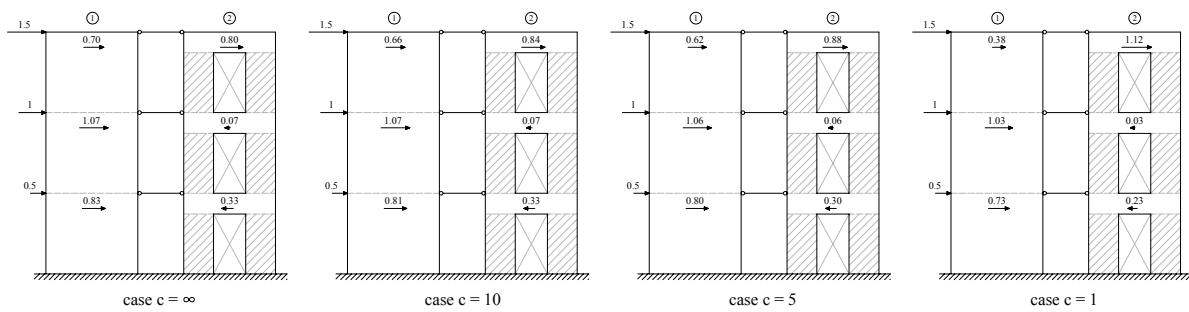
Solid RC wall – opened masonry wall combined model (case 2)
